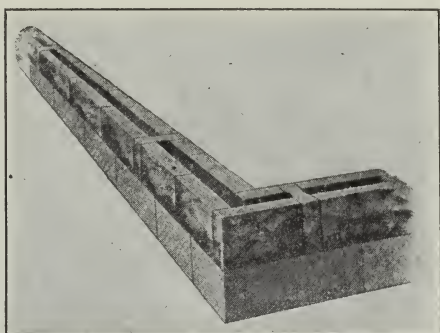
Hollow Wall of Solid Concrete Blocks.
